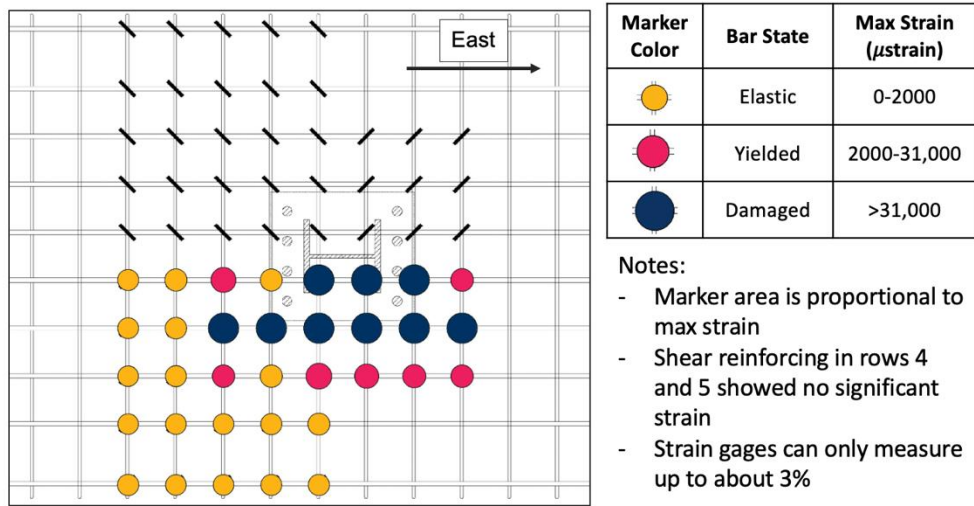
Specimen M02 plan view showing maximum strain felt by each shear reinforcing bar
